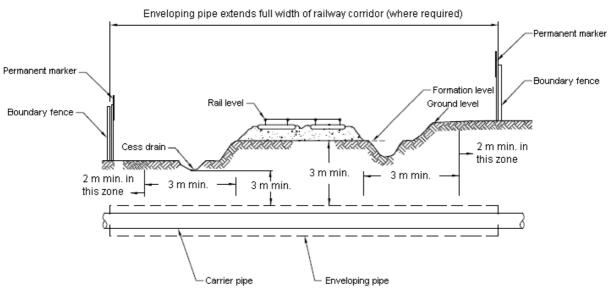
Cross-section Showing Service Pipe Under the Railway Corridor Installation by directional drilling
